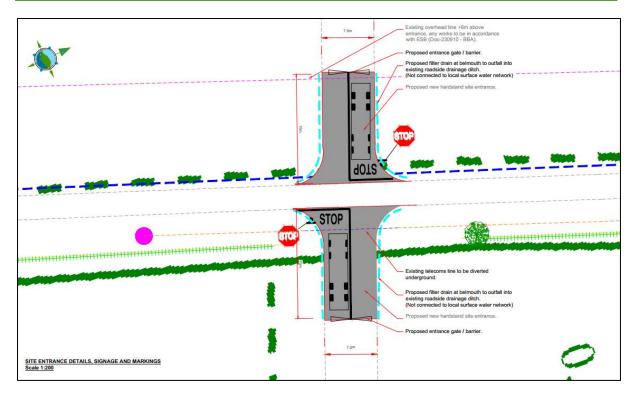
Site Access L7451 Crossing Point Works (extract from Drawing No. 10730-2053)
